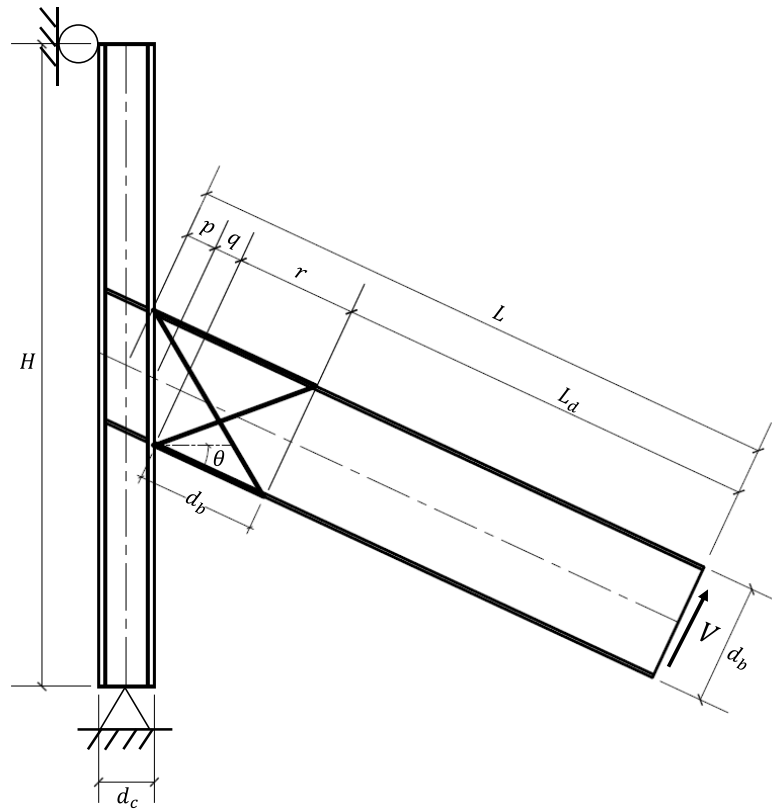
Truss Model Proposed by Goel et al. (1997) Overlapped on a Sloped Moment Connection
